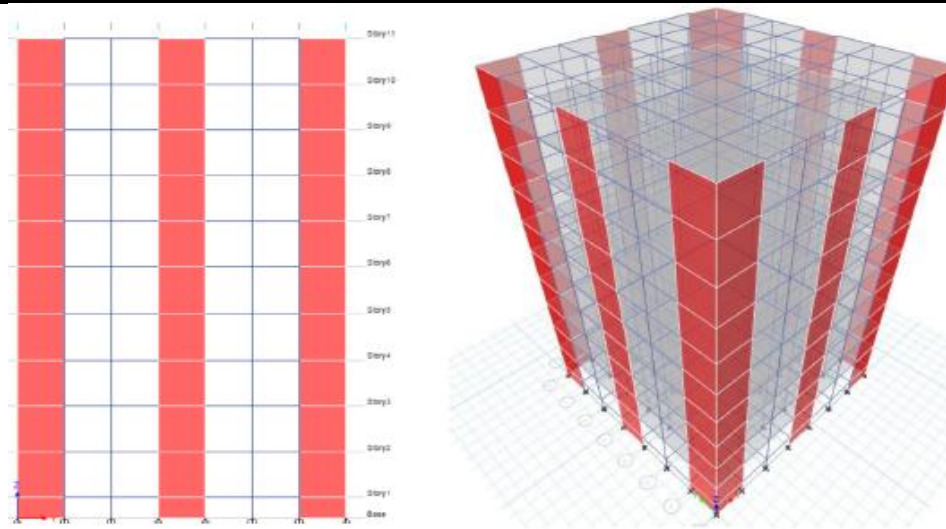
Typical Plan and Elevation Structure (M-1)
